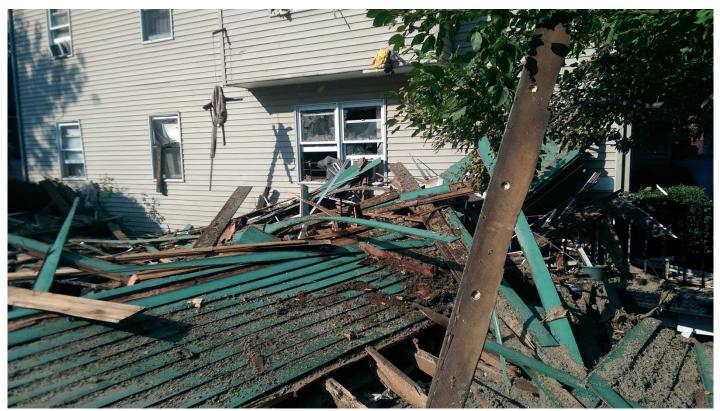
(8/10/2014) - 304 Paige Street exterior damage.
